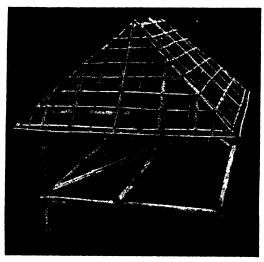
Showing wood construction of a model rat-proof atap roof.
